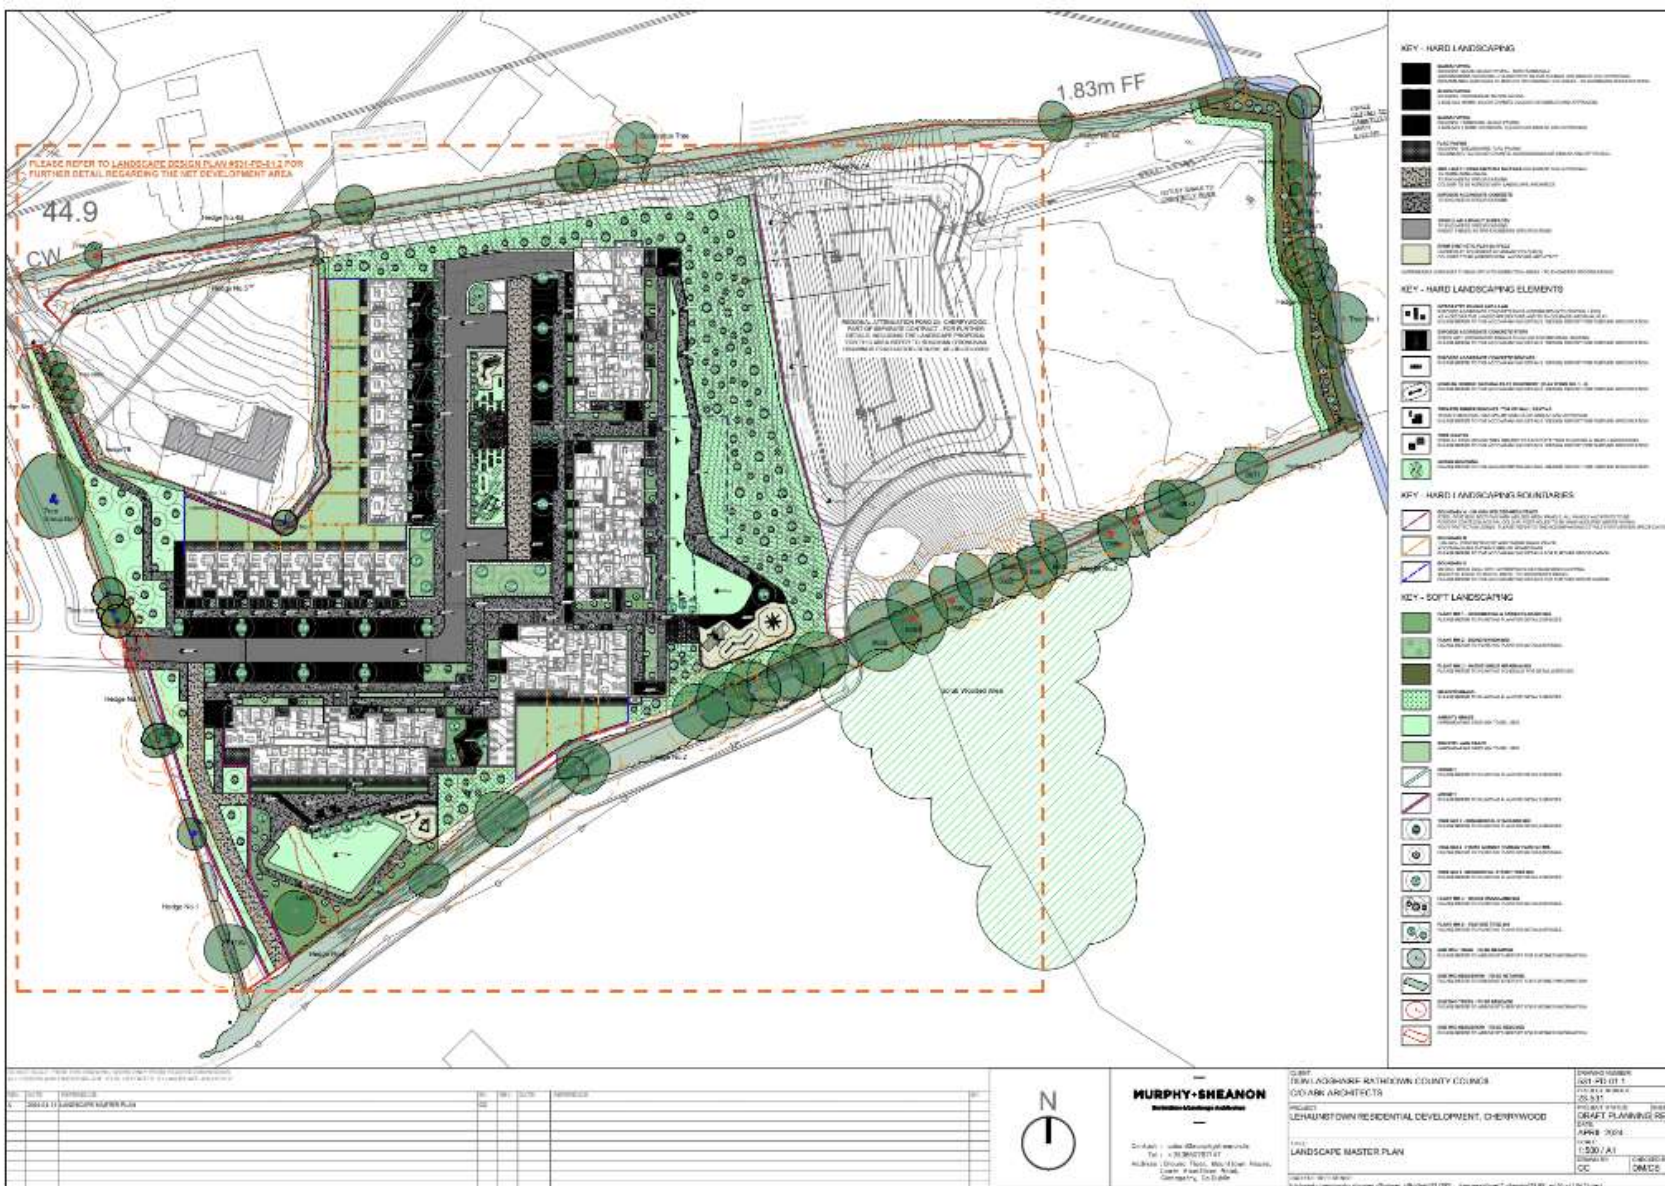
Site Layout with landscaping overlay – see landscape plan and planning report for further details
